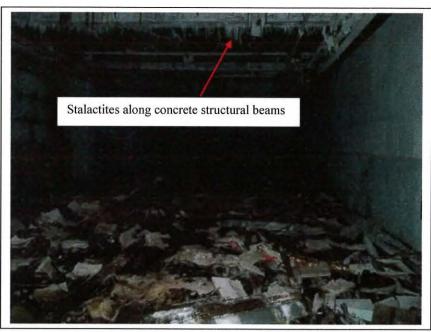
Former bowling alley located in the basement of the Buckner Building. Presumed ACM-containing ceiling and wall tiles litter the floor of the former bowling alley. (September 8, 2014)
